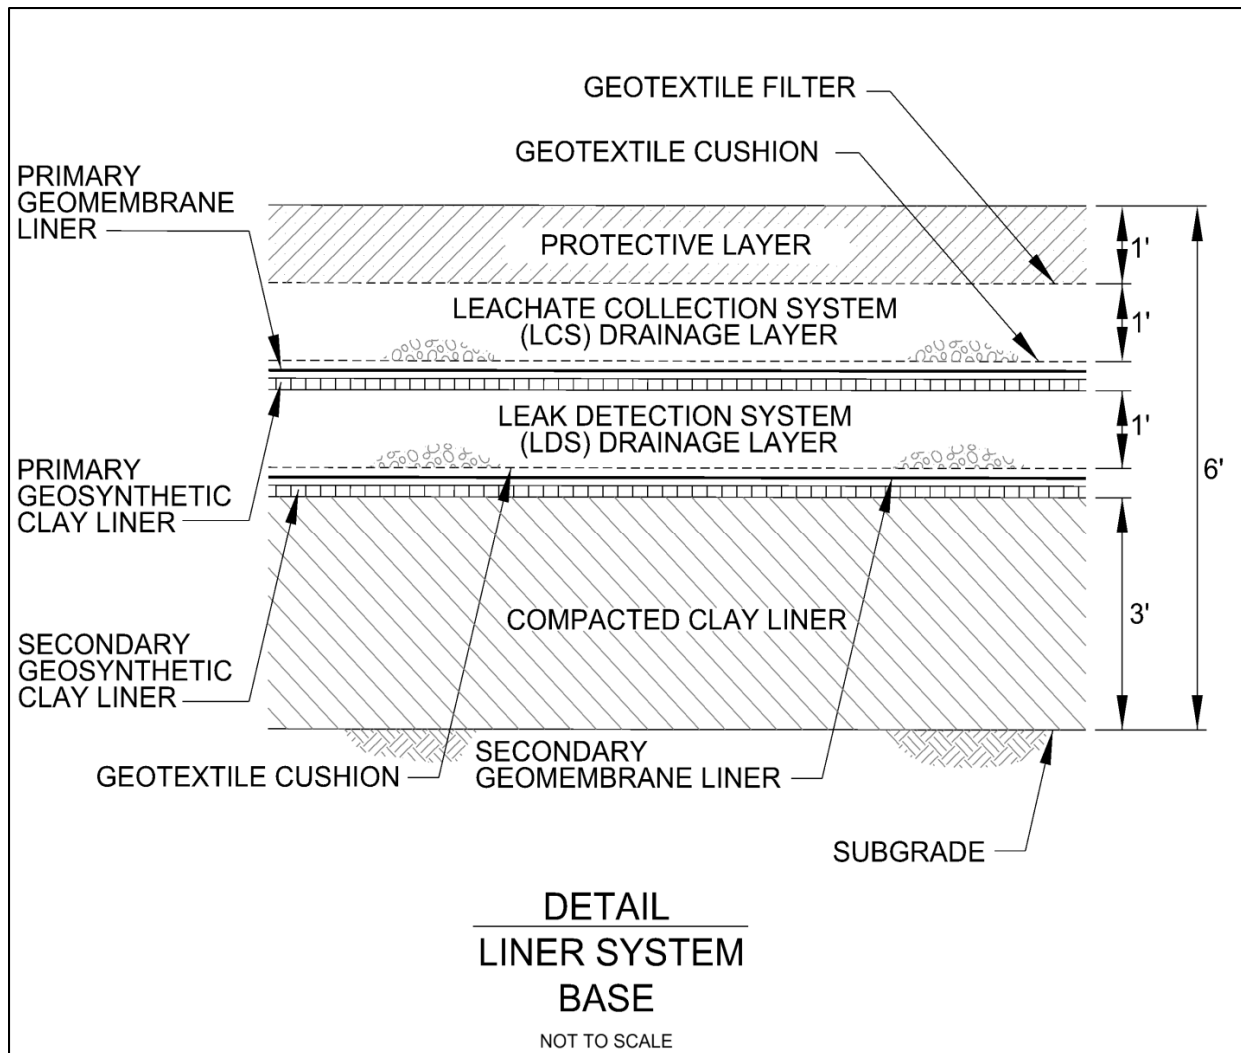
Typical Section View – Landfill Base Liner System Details for a Potential OSDC at PORTS
